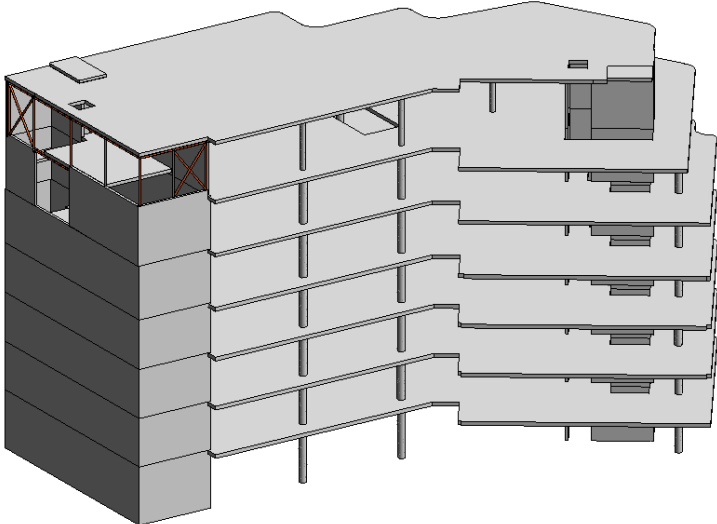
Model in Revit, stripped from non-bearing members, neighbouring buildings removed [20]
